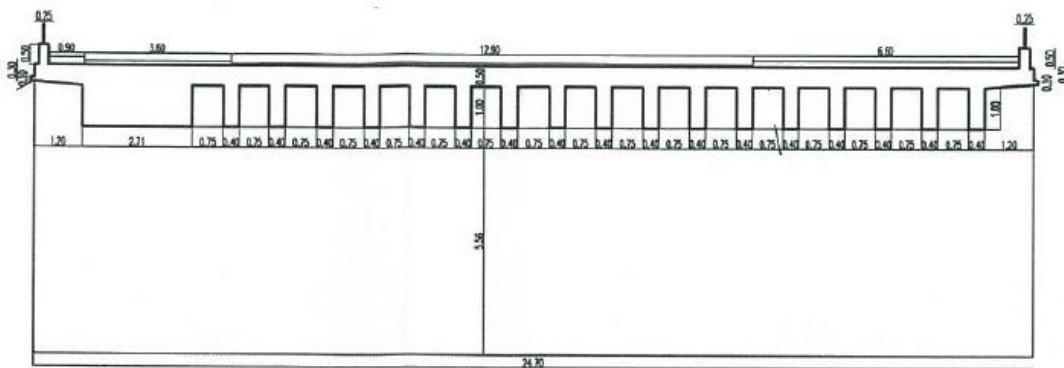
Longitudinal view of abutment wall and cross-section (1-1) of superstructure (location and dimensions of main beams).
